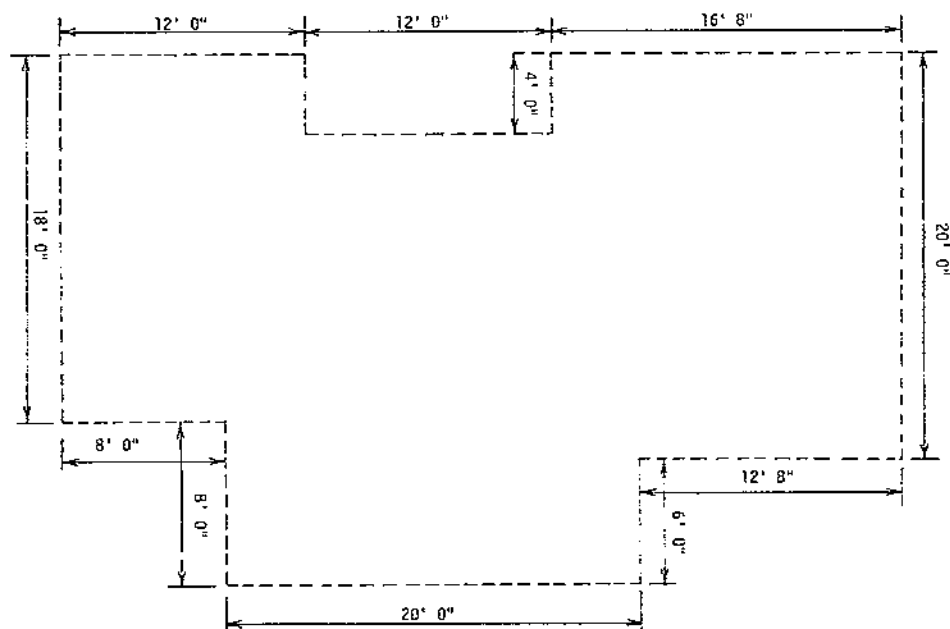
Floor plan of typical house to be fitted with standardized panel foundation.
